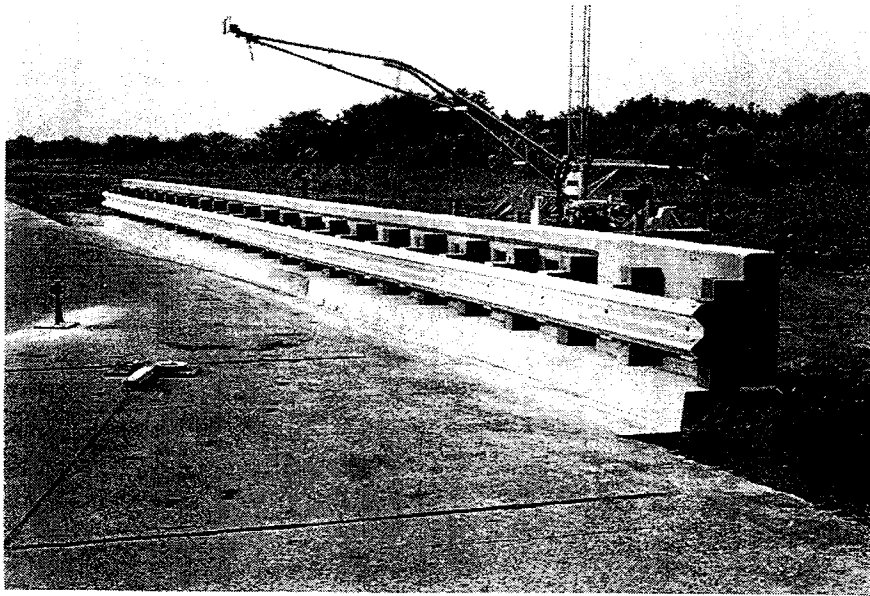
W-beam retrofit for baluster bridge railing before test 472070-2.
